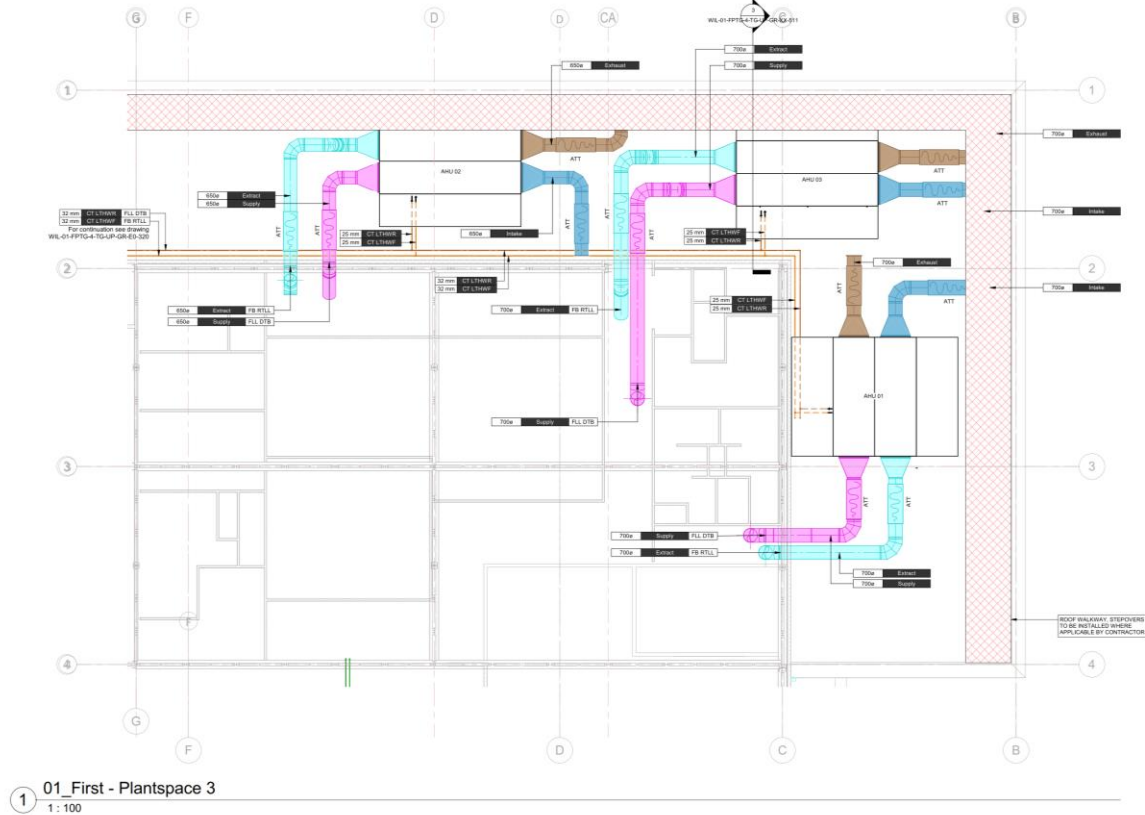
Proposed roof plant above Office Area (North Eastern Corner) – Phase 1 (AHU units) (2/3) – Roof Section
